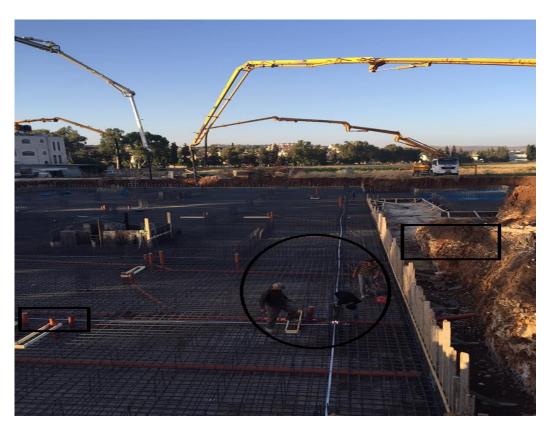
3: Excavation and Steel rebar activities without any safety precautions
